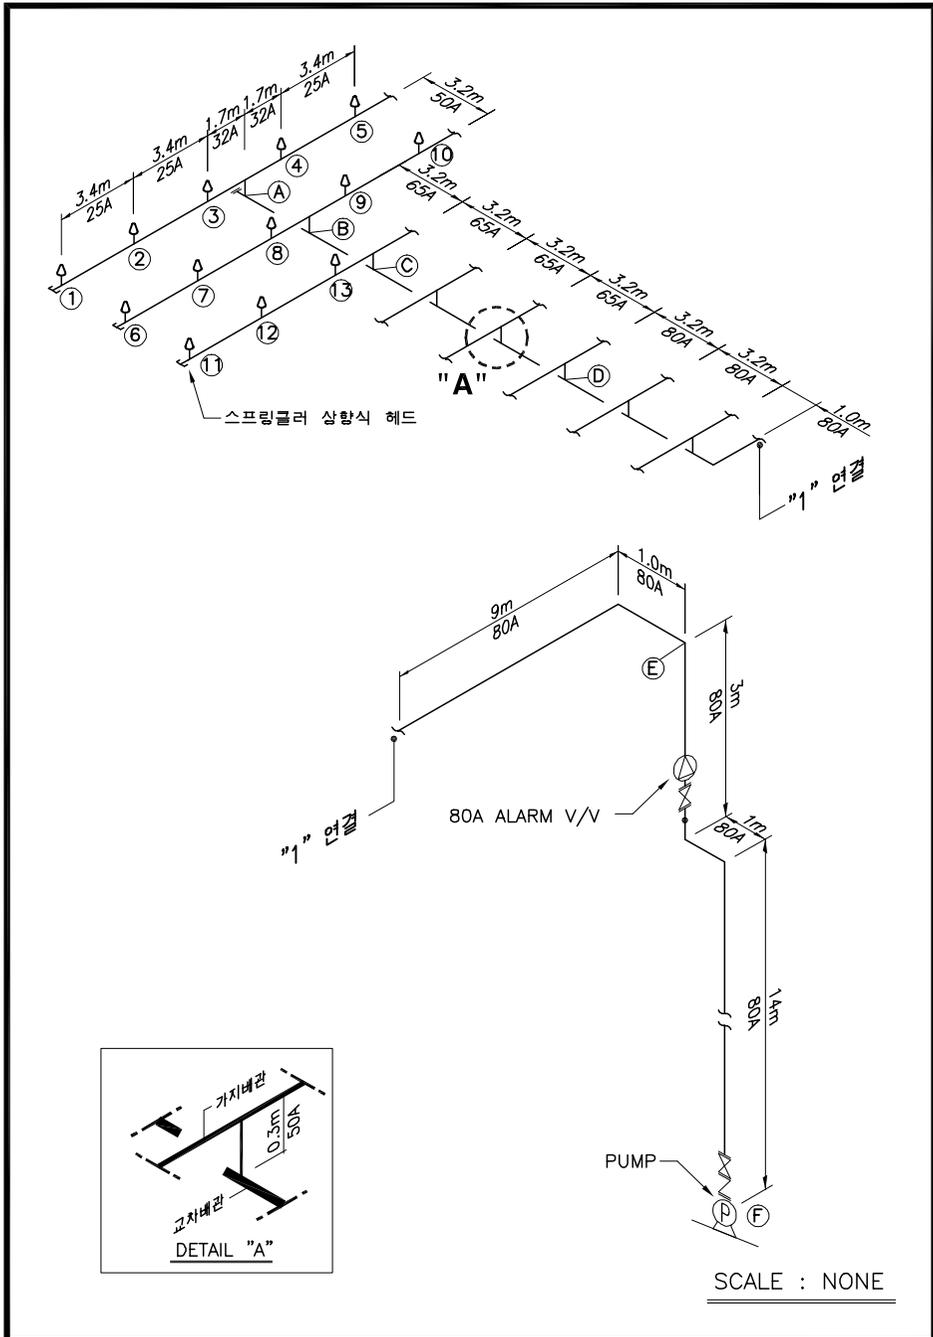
Isometric View of Hydraulically calculated Sprinkler System
